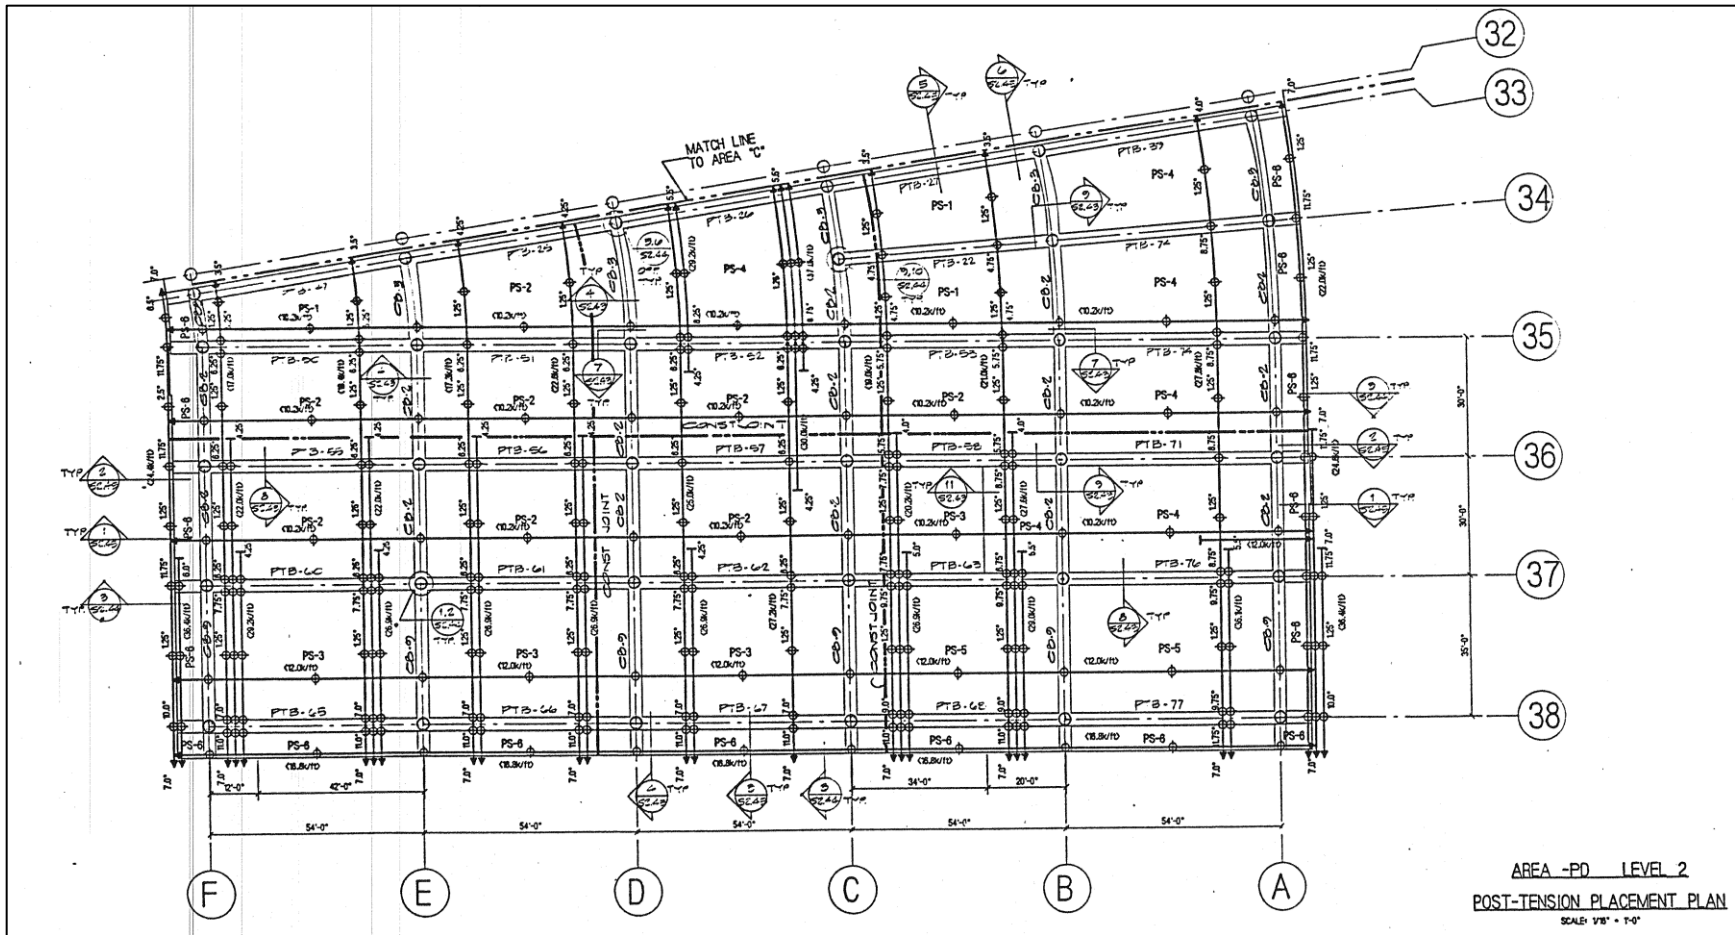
Example of the as-built structural drawings from 1988 showing the first floor (“level 2” on drawing) post-tensioning reinforcement system in structure D (the southeast corner).
